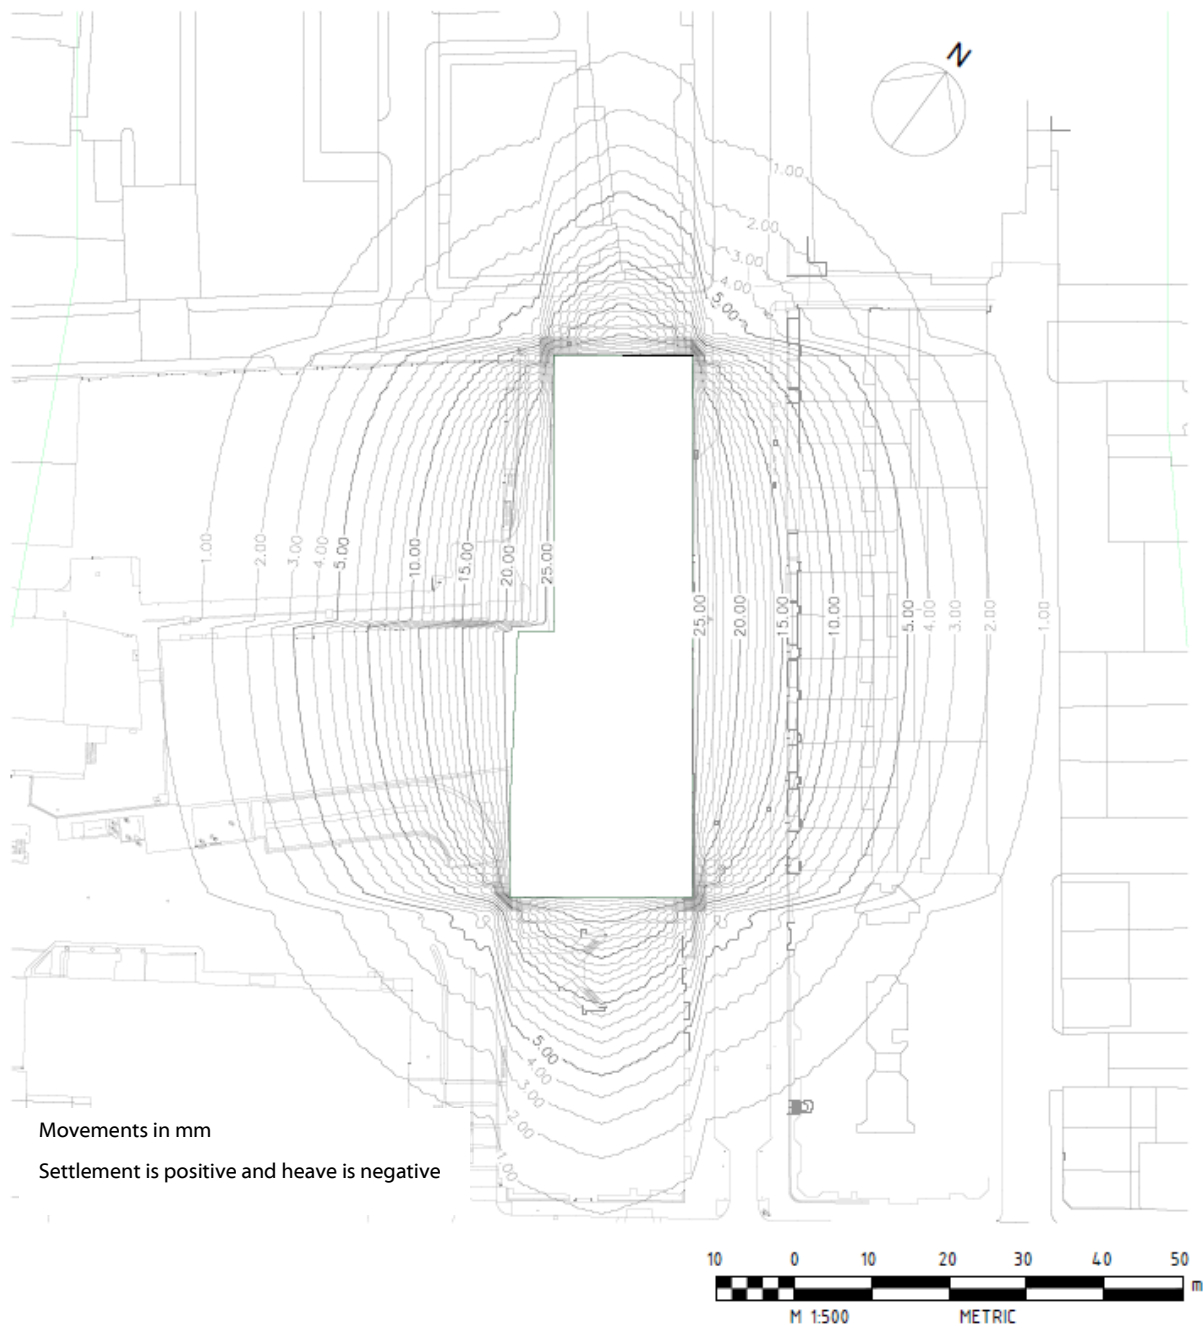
Ground level contours - Case E (Retaining wall deflection)
